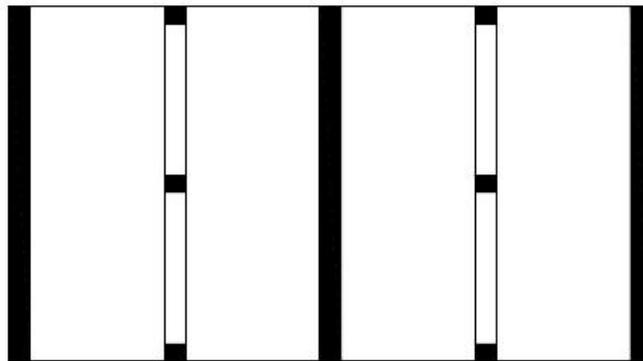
System with distributed walls throughout the facility by integrating the frames in plan.
